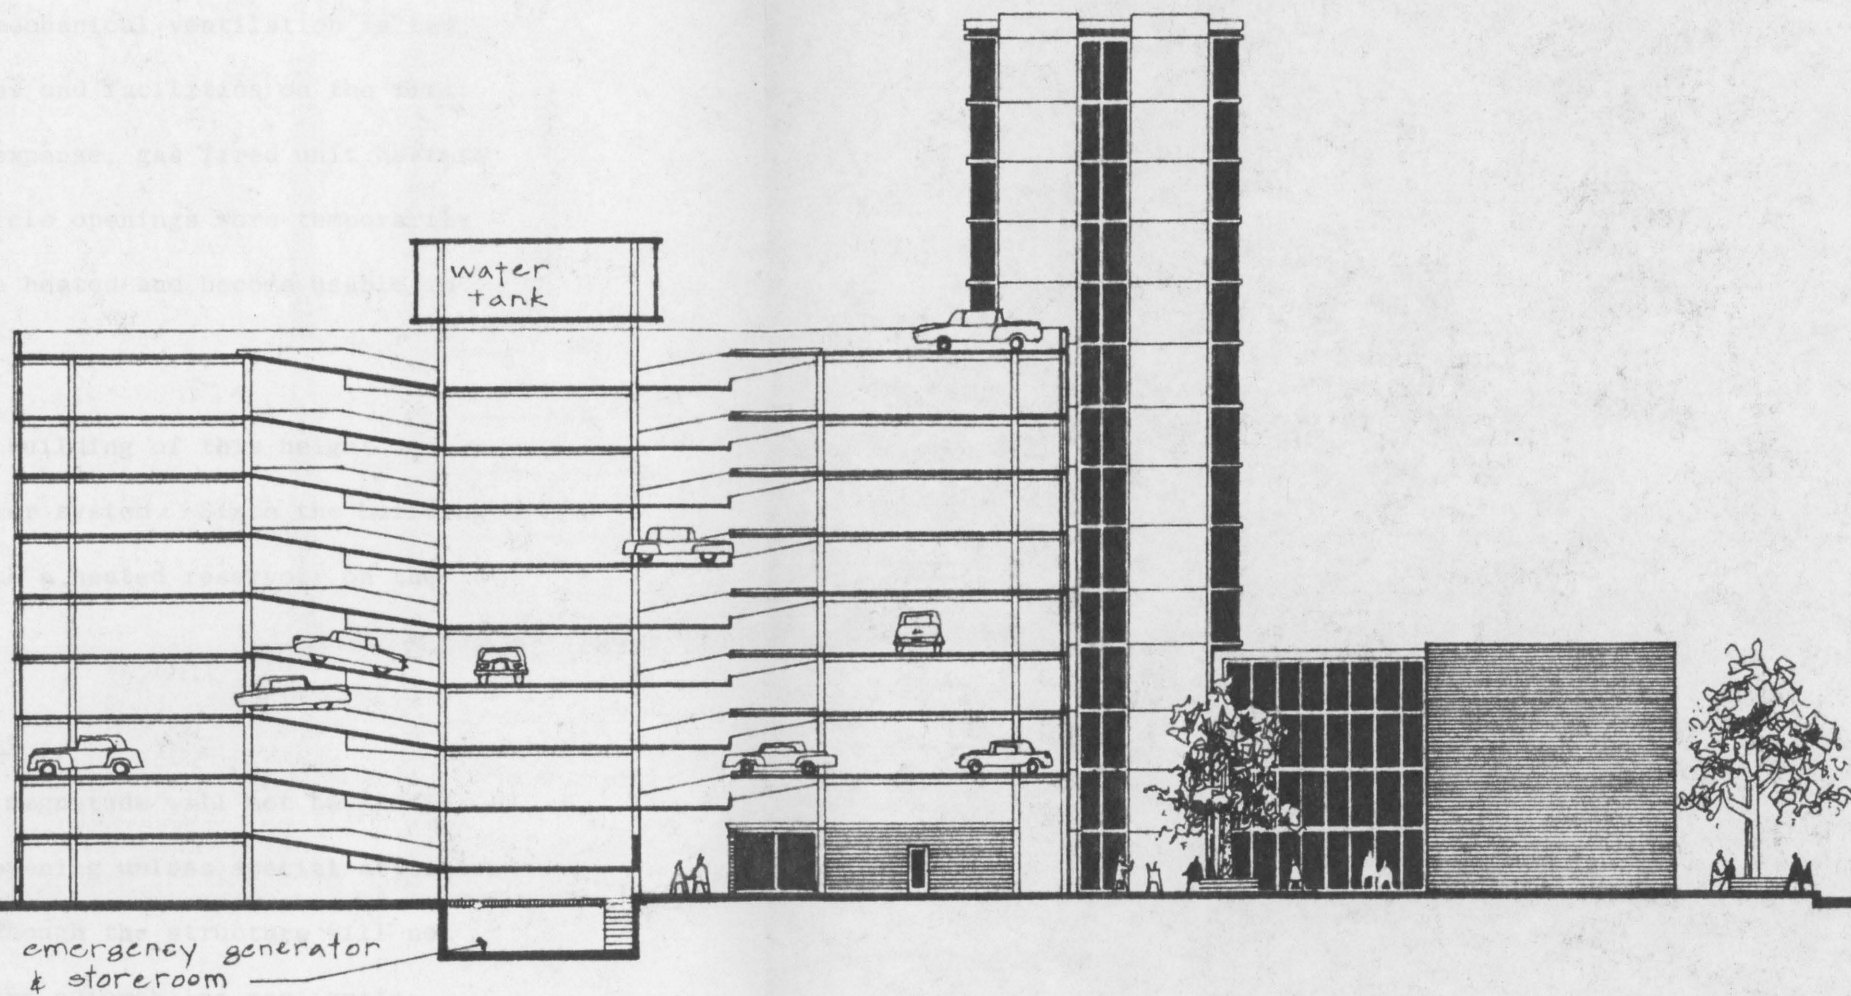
3 ELEVATION OF BUILDING "A"
